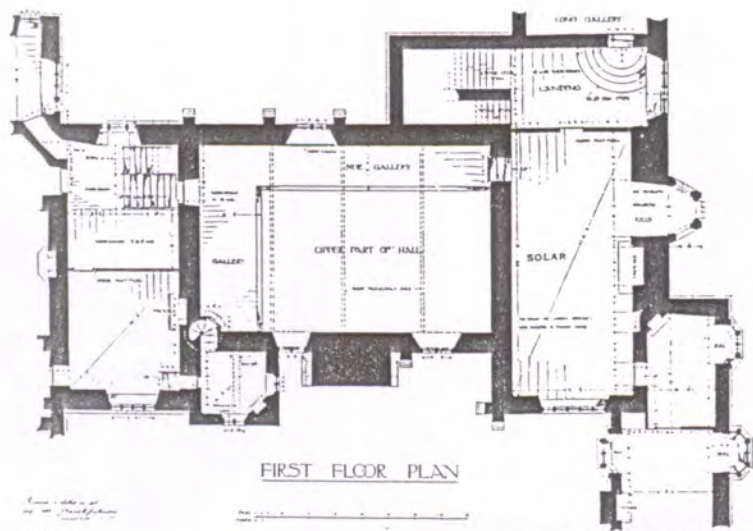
HADDON HALL, DERBYSHIRE. First-floor plan.
